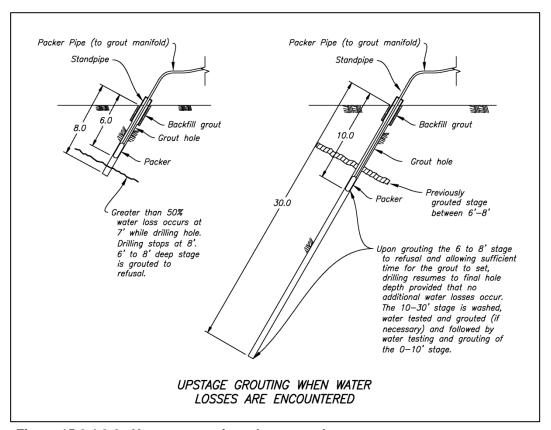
Upstage grouting when water loss occurs.
